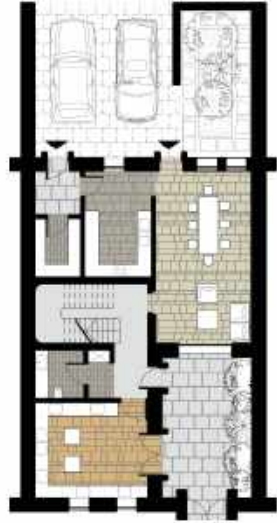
A-27 Ground floor of a standard townhouse with formal area
